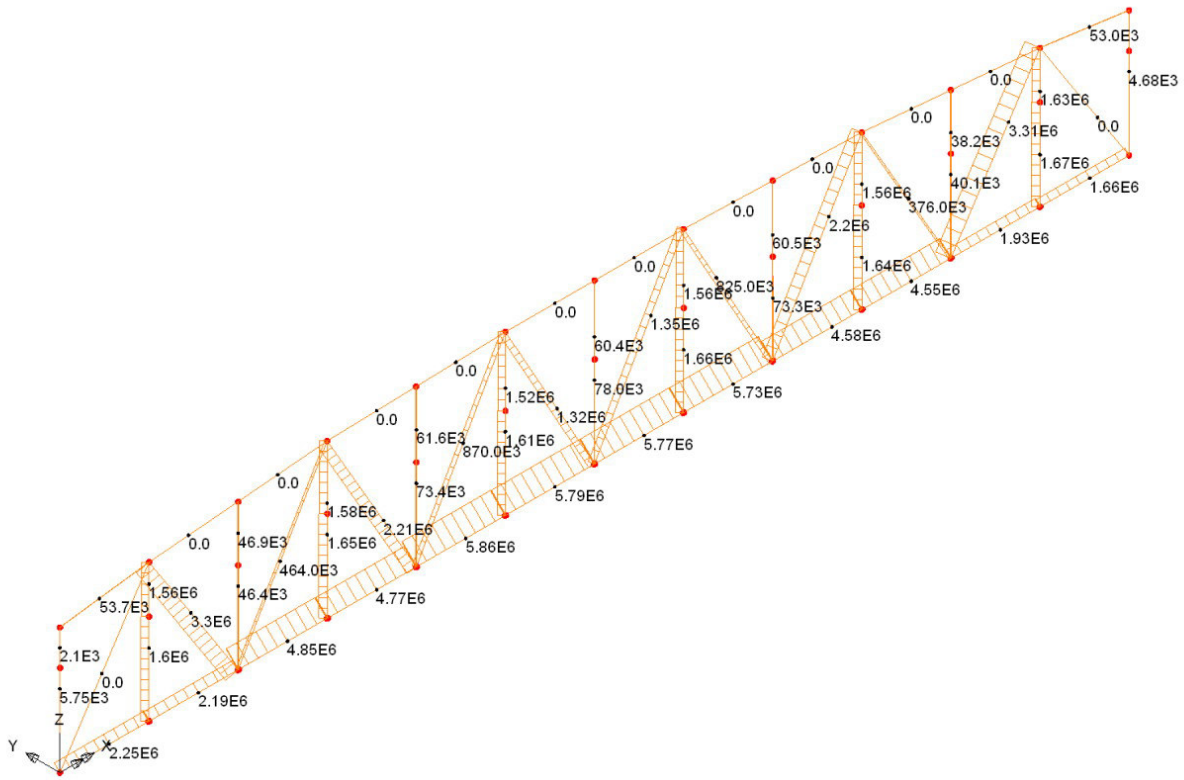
Lift Span Highway Truss Members Axial Forces-Combination 4-Maximum Tension
